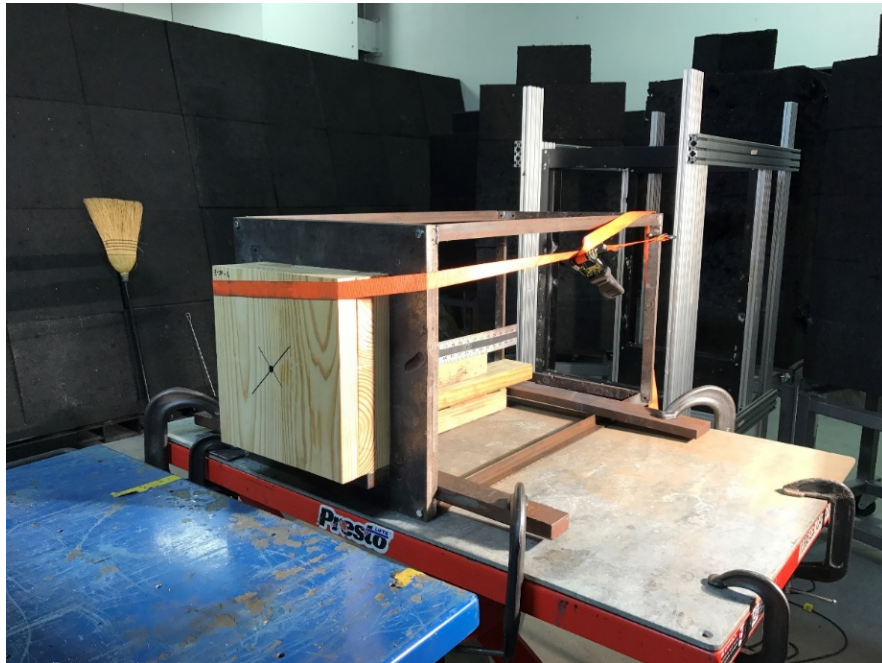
A CLT specimen mounted on the steel frame-lift base in preparation for a test shot.
